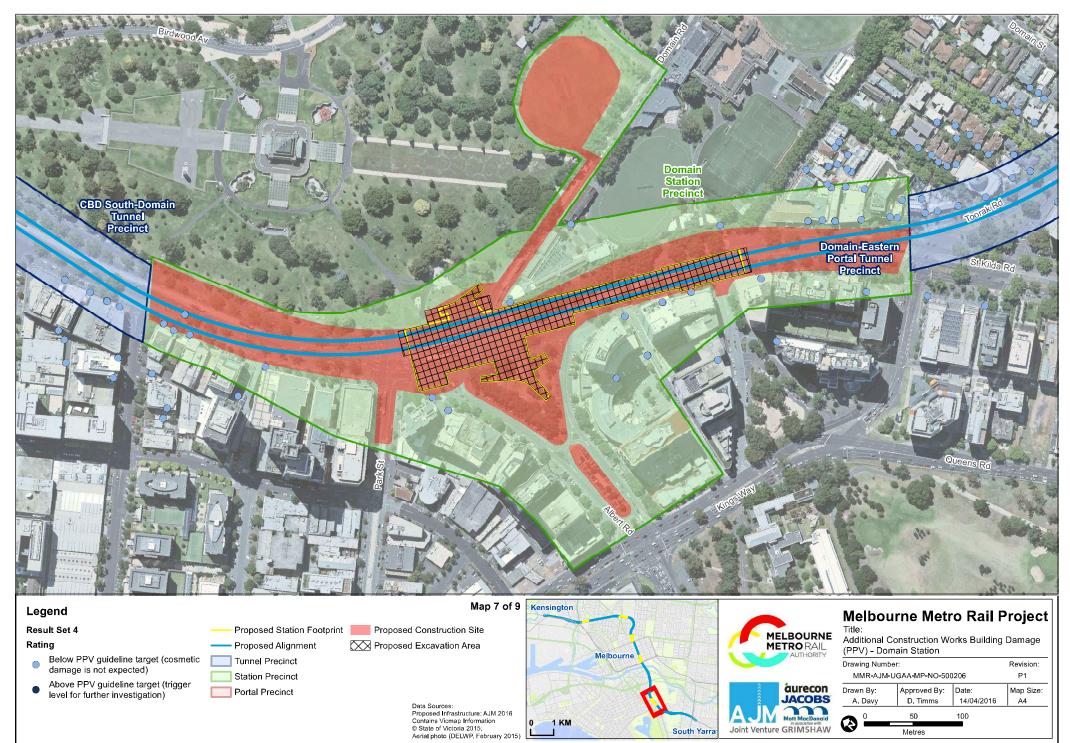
Colour coded building damage assessment due to Additional Construction Works – CBD South to Domain Tunnel Precinct
